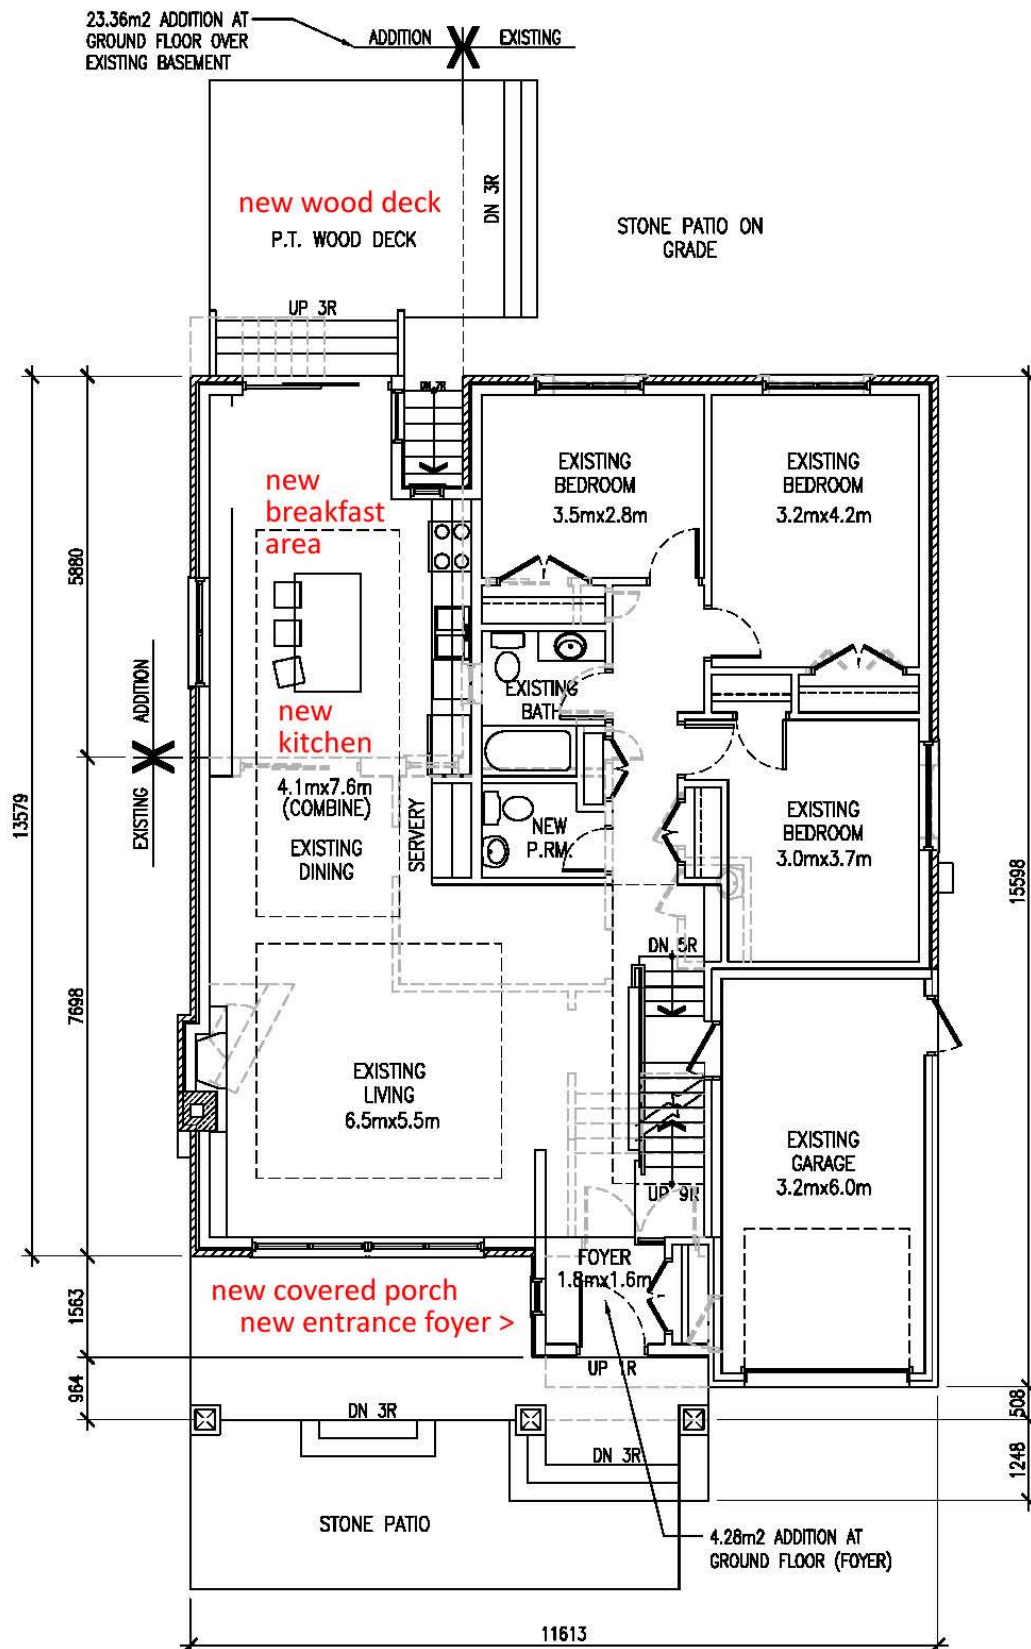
Proposed ground floor plan, with new spaces identified and new wall construction highlighted by the author of this report. SOURCE: See Figure 10.
